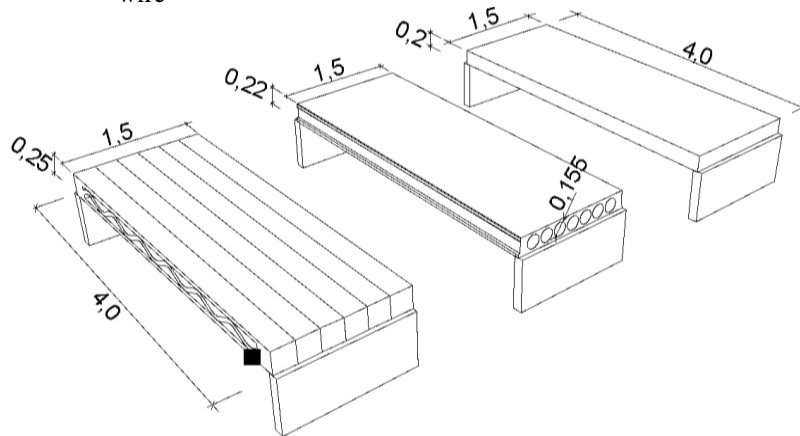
Slab diagrams: (a) prefabricated slab made of rotatable 3D printed segments, (b) hollow core slab, (c) solid slab
